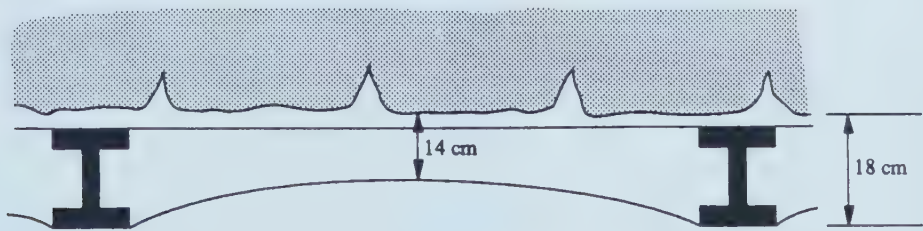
Longitudinal Cross Section of SLRT Lining, NATM Tunnels
